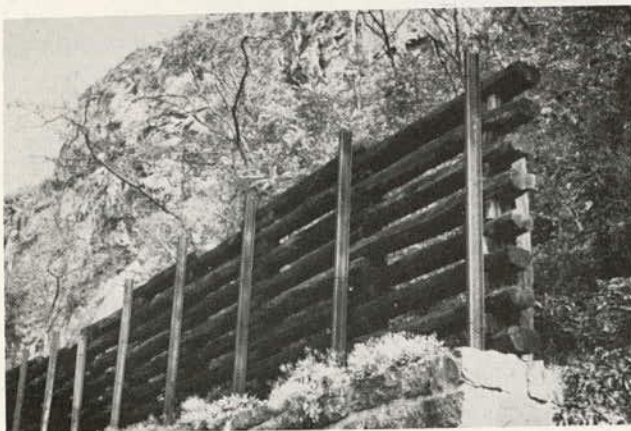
Rail wall with vertical posts seated in cast-in-place footings (note top of wall anchored by cables to bedrock for support).
